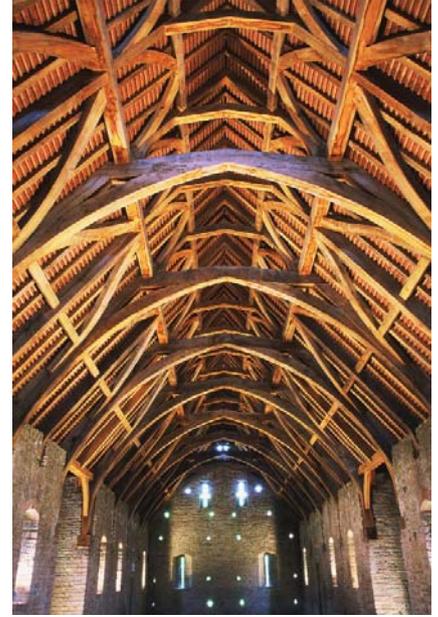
(above and left) Pilton Barn, Glastonbury. Reconstruction of roof destroyed by lightning
